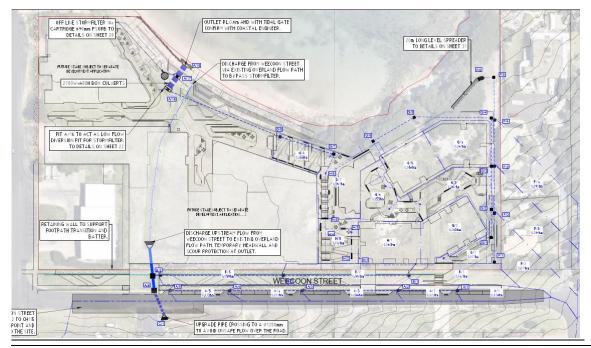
PROPOSED STAGE 1 STORMWATER WORKS:
